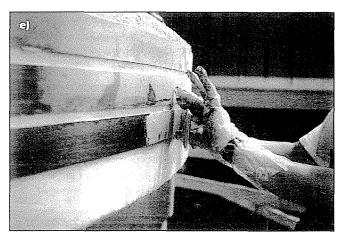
Strengthening of a grain silo in Berettyóújfalu, Hungary, owing to the corrosion of circular prestressing tendons (Date: June 1997, Strengthening strips: Sika CarboDur S612-152 m. Designer: Dr. György L. Balázs. Exec: Isobau Rt.) a) Photo of the silo
